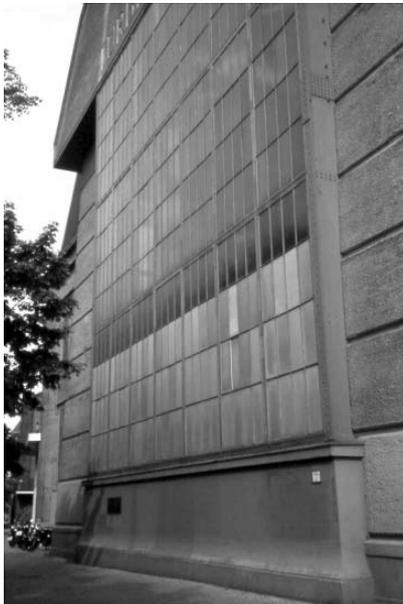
AEG turbine fitting shop, footing with projecting base the nave front window
